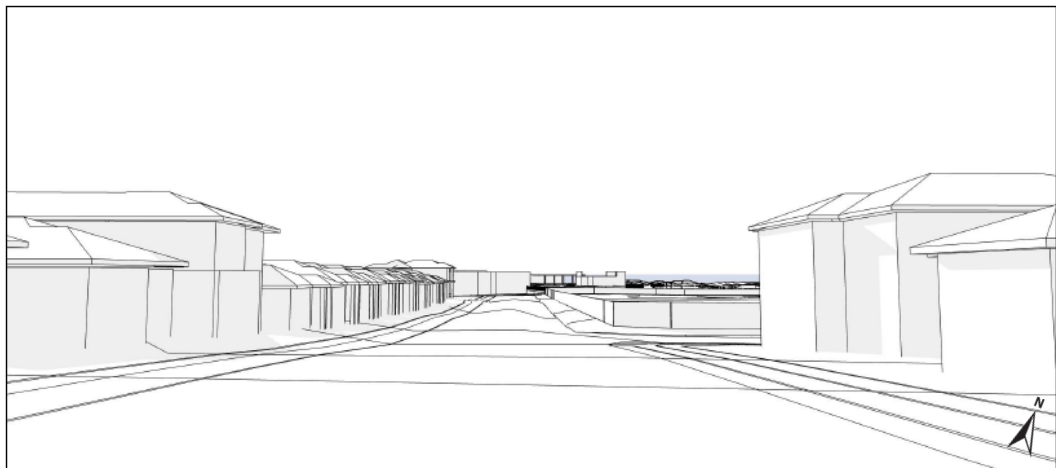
Existing view looking west on Wallarah Circuit (Source Bennett and Trimble) Not to scale
